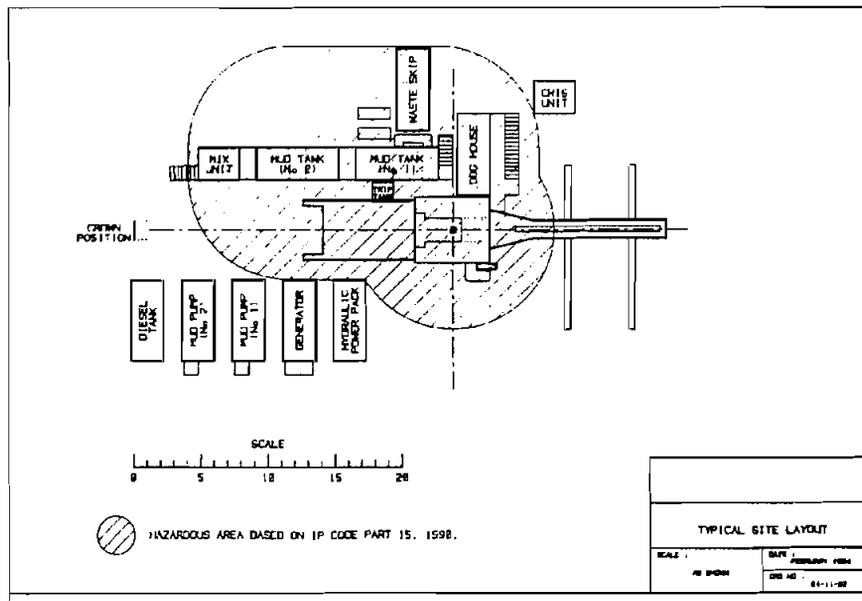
Typical Site Layout (Beswick and Hills, 1995)
